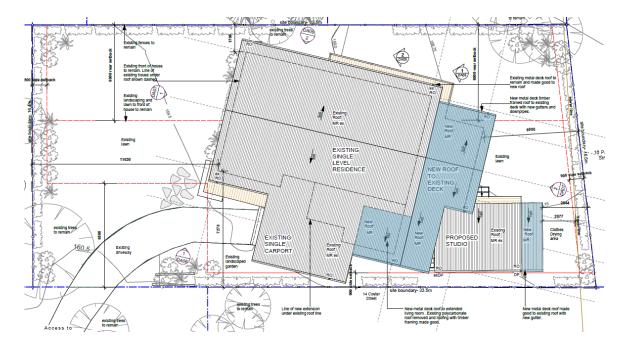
Extract from attached Plans (Site and Roof Plan DA03)
